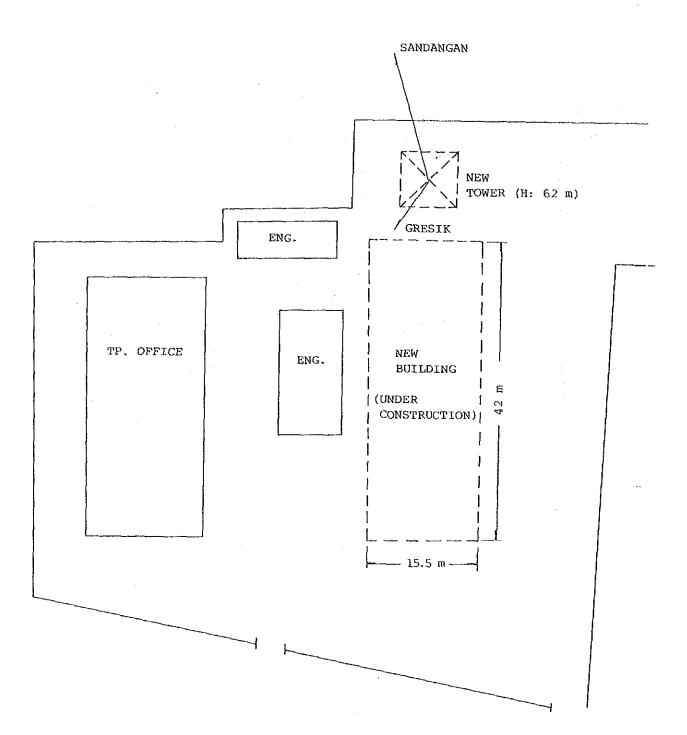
Surabaya Microwave Terminal Station (New) Layout Plan
